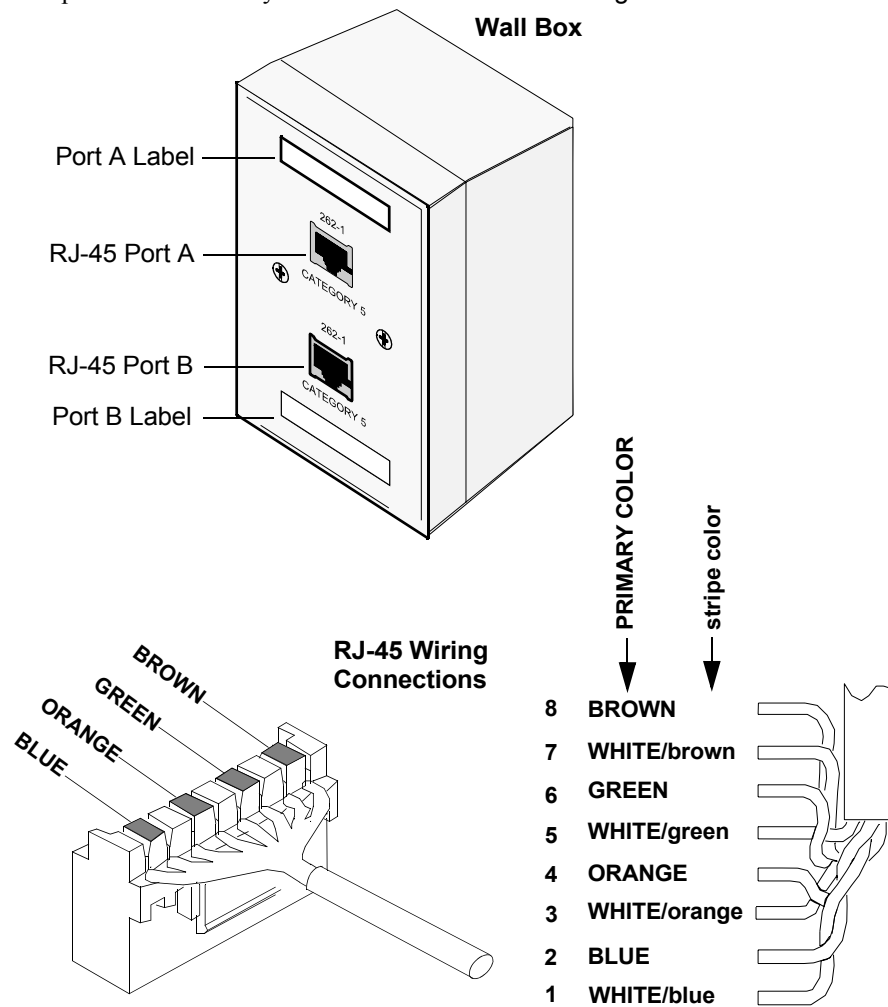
RJ-45 Wall Box and Wire Connections for UTP Cable
